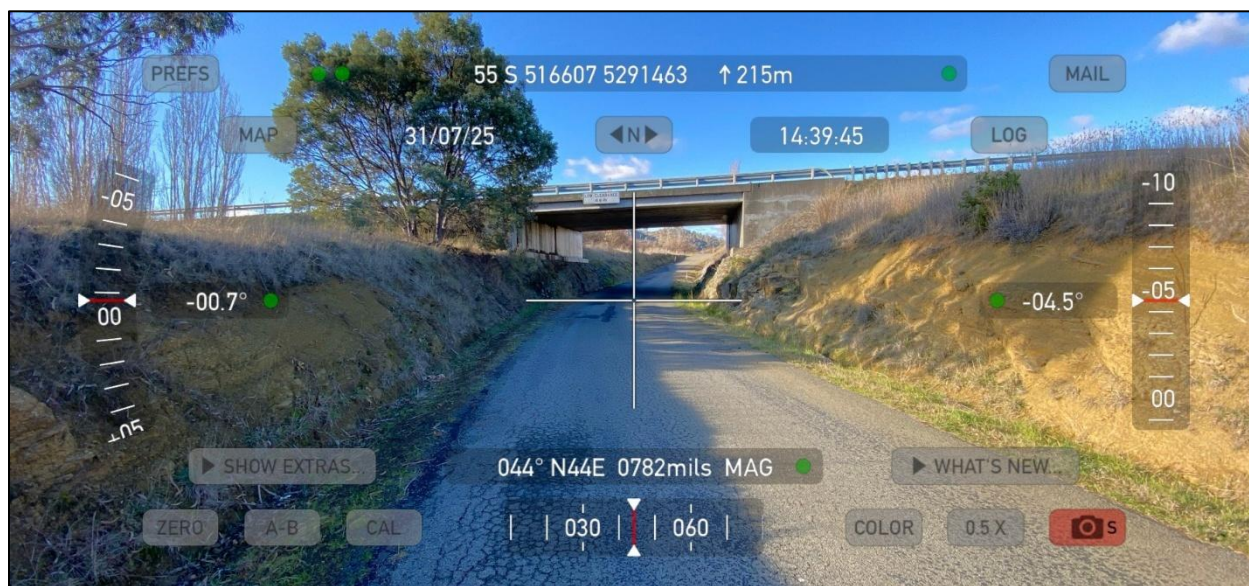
Sealed section of Grange Road on approach to the underpass crossing the Midland Highway
